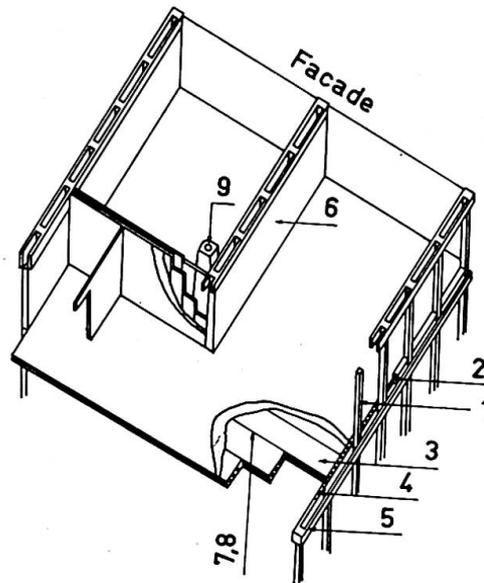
1, Concrete column - 2, Rock wool filling - 3, Floor slab unit - 4, Cork bearing pad - 5, Floor beam - 6, Division cavity wall of 2 10 cm foam Light-weight concrete and filled with 3 cm rock wool - 7, Skim coat over joints - 8, Cement mortar - 9, Prefabricated refuse chute.
